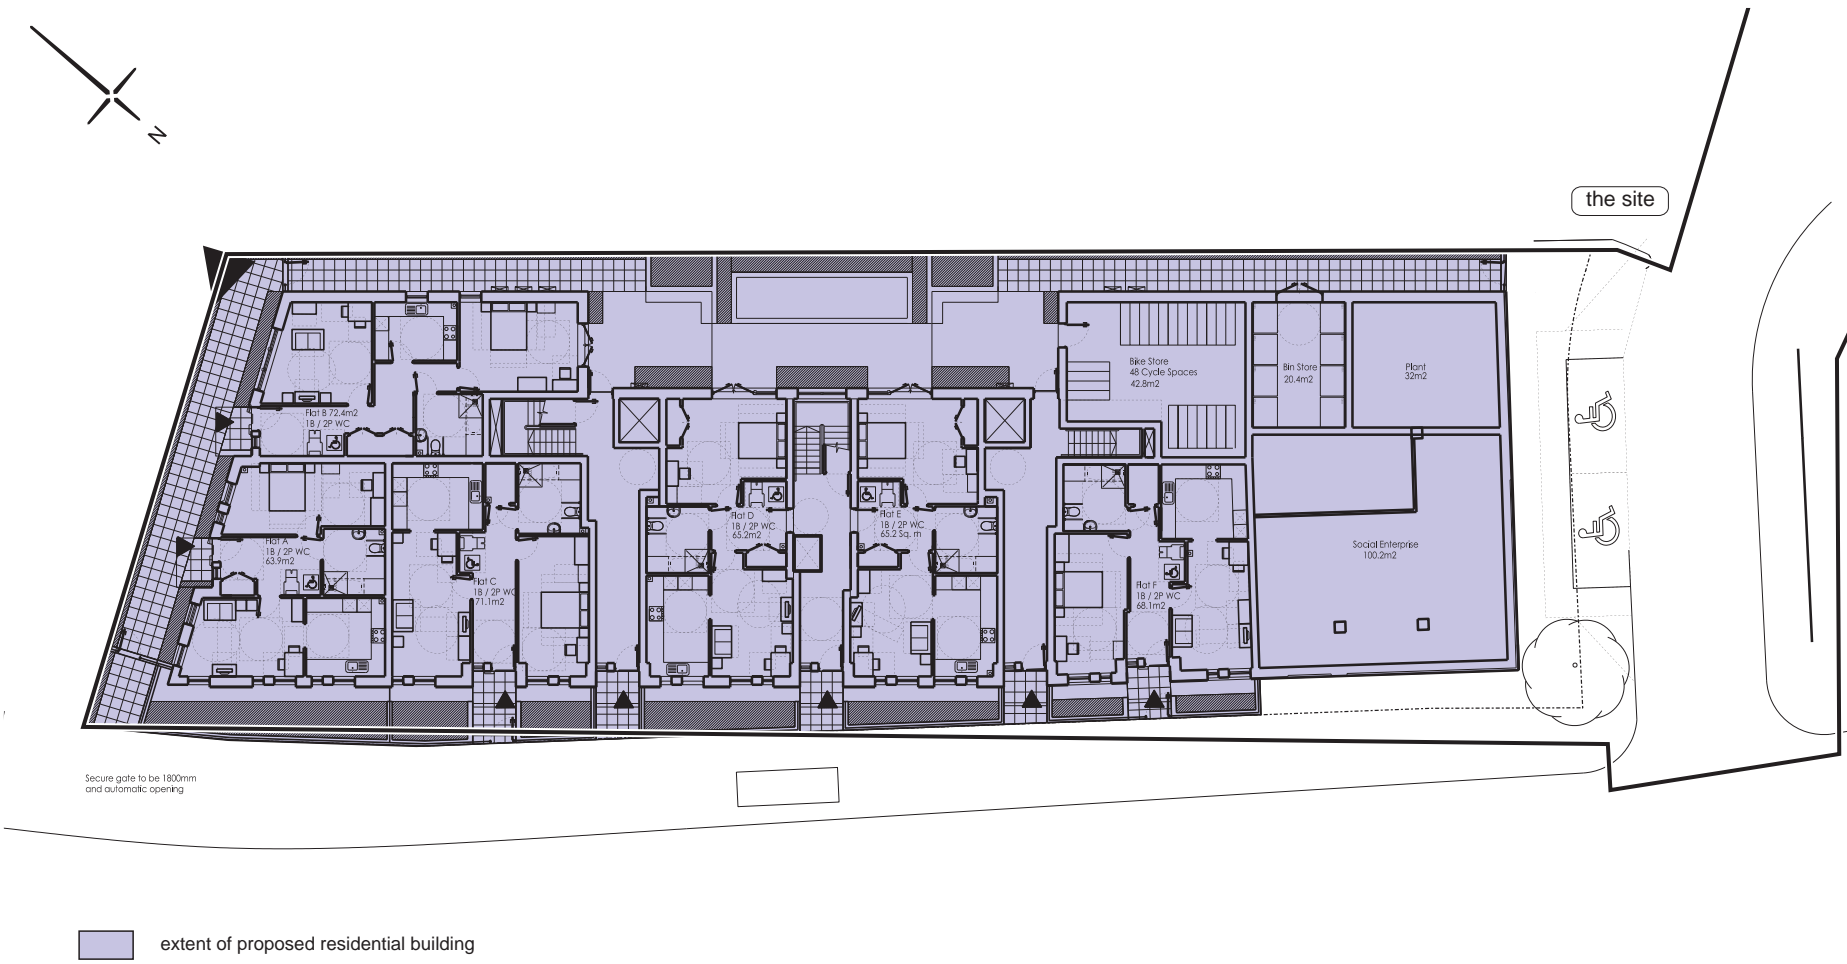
Proposed ground floor of the residential building (PCKO Architects, dwg SK 400, Rev A, date June 2013)
